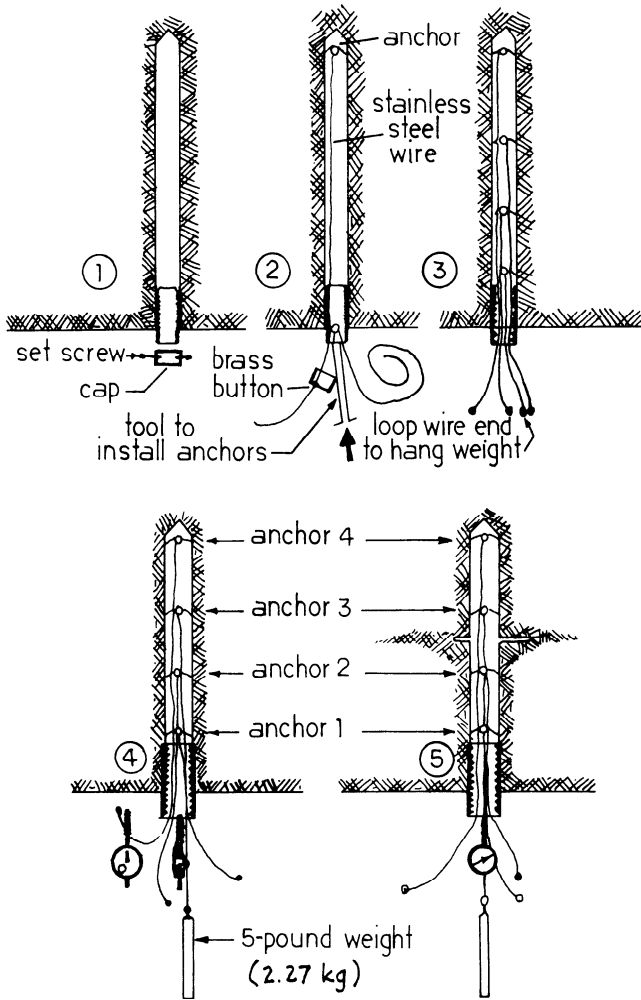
Differential sag measurement system (after Haas, 1982).
